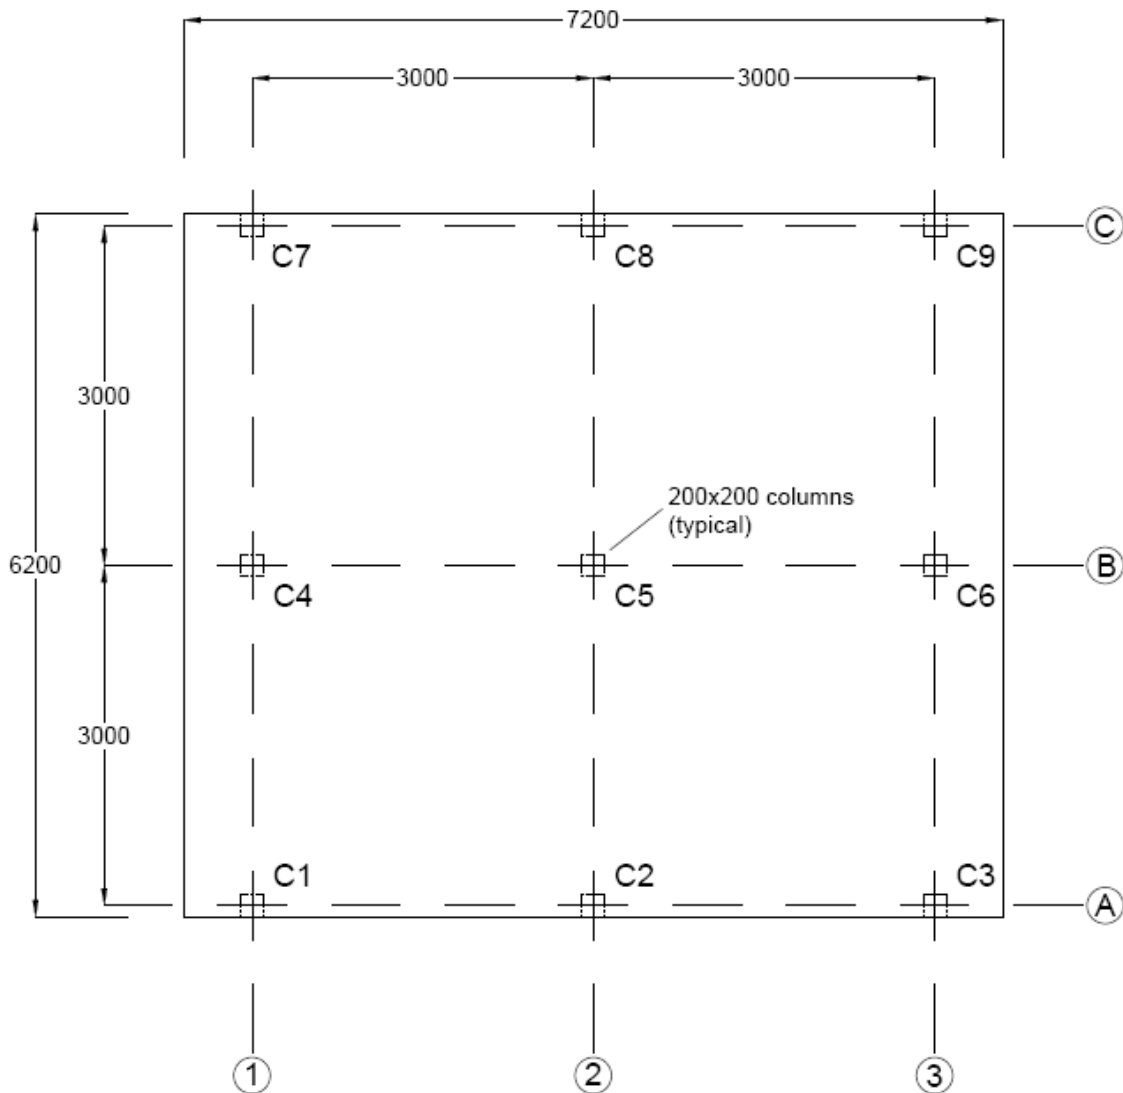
Guo & Gilbert (2002) S1 Slab Plan (Dimensions in mm)
